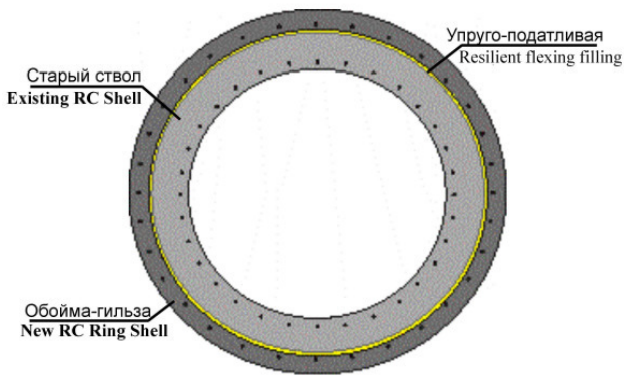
Scheme of Shoring the Chimney Reinforced Concrete Stem with a Ring-shell.
